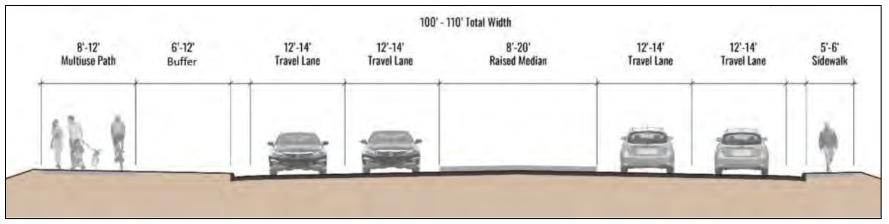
Typical section of 88th Avenue between Brighton Road and Quince Street
